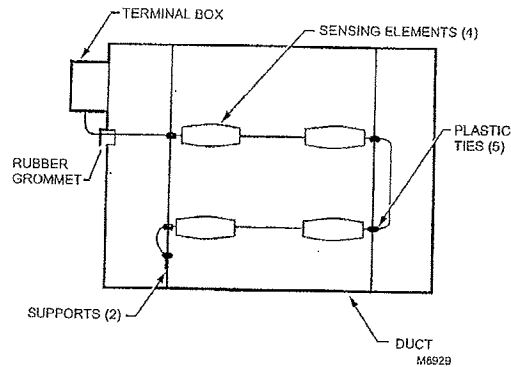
Duct cross section showing method of installing C7041J Averaging Electronic Sensor.
